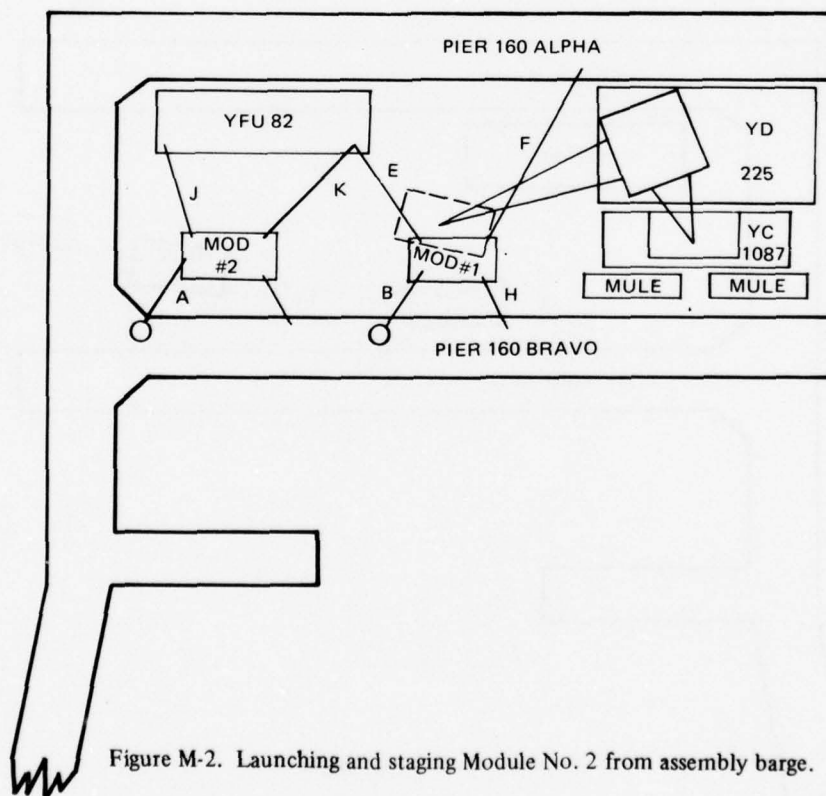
Launching and staging Module No. 2 from assembly barge.
